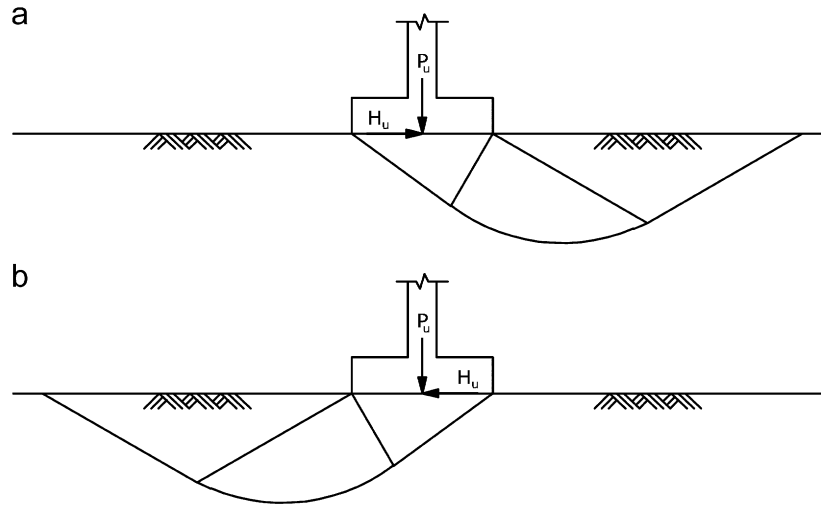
Schematic of bearing capacity failure surface for shallow foundations in case of horizontal and vertical loading: (a) horizontal load acting to the right; (b) horizontal load acting to the left.
